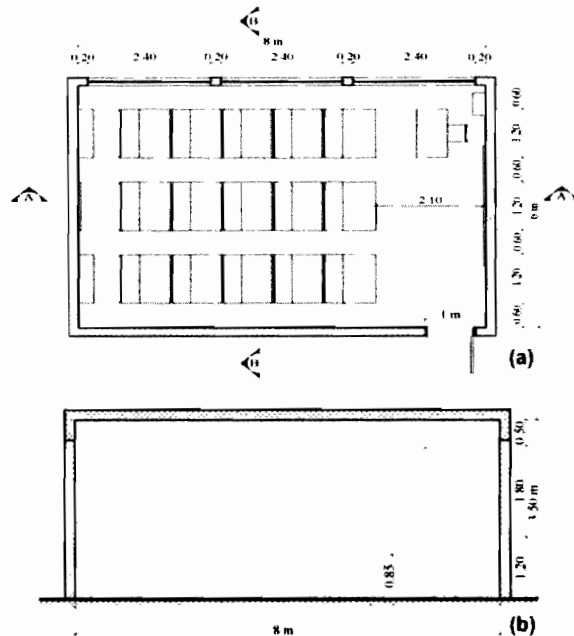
Plan (a), section (b) of a typical classroom in Libya (source: Drawing made by author).
